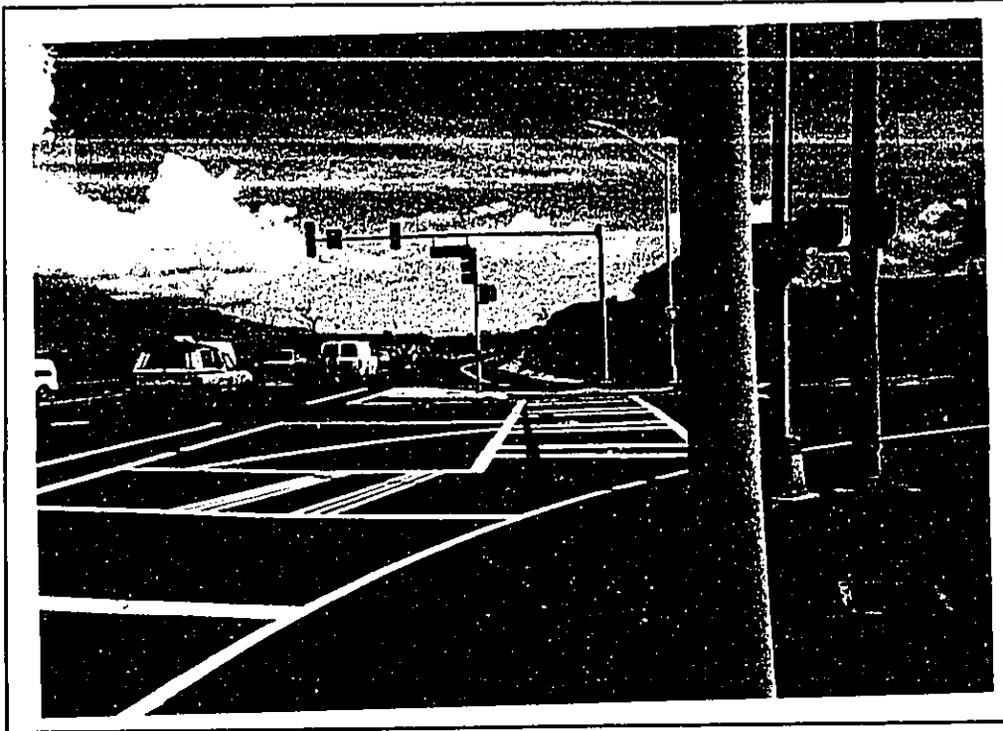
Looking north along Piilani Highway from southeast corner of Piilani Highway/Lipoa Street intersection.
